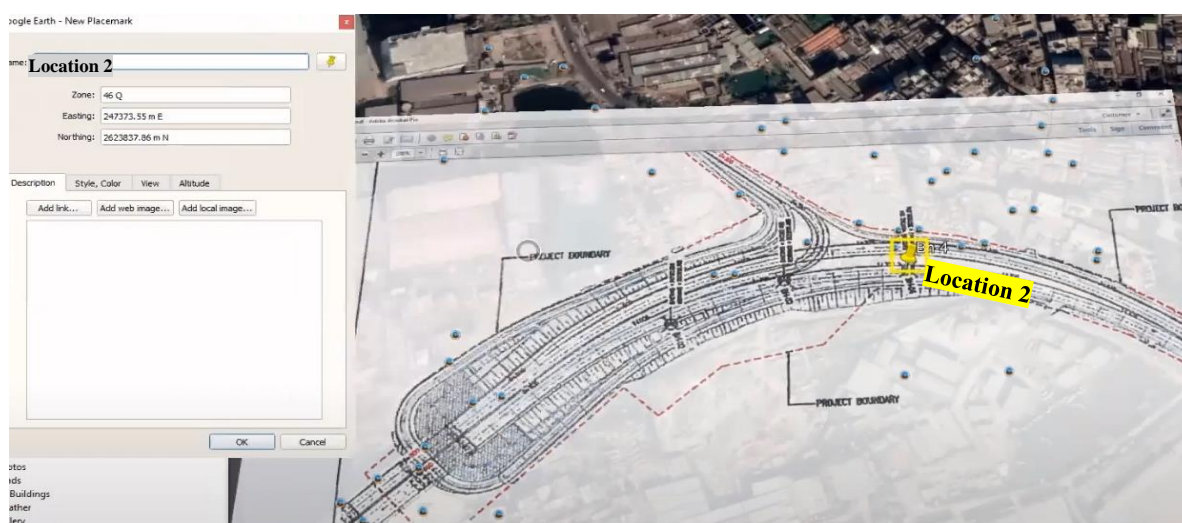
b: Kanchpur, Meghna, Gumti 2nd Bridges Construction and Reconstruction of Existing Bridges – Location 2
